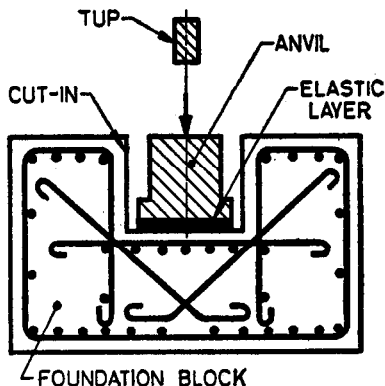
TYPICAL REINFORCEMENT DETAIL
